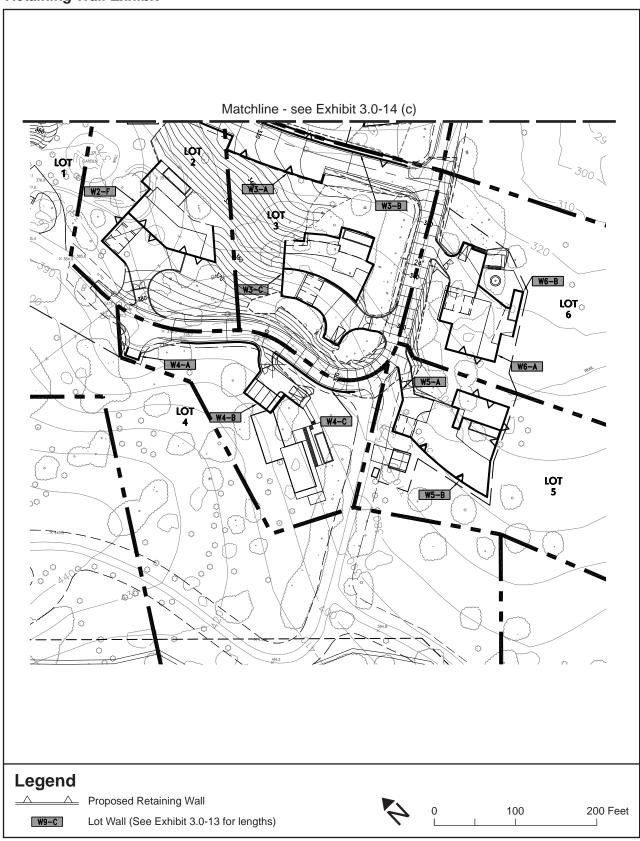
(d) Retaining Wall Exhibit
